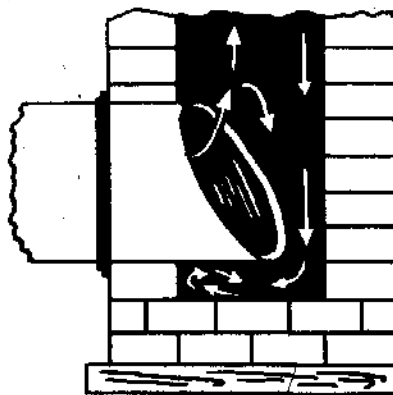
If chimney ends only a short distance below point where smoke pipe enters, make "toothpick joint," as shown. Remove soot from below flue opening regularly.
